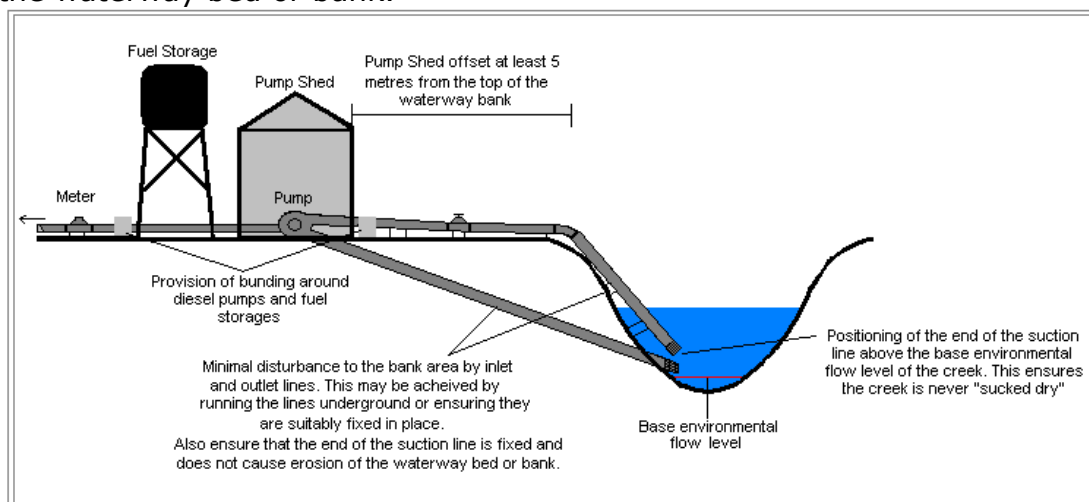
cross section of the 'right' way a waterway off-take should be installed
